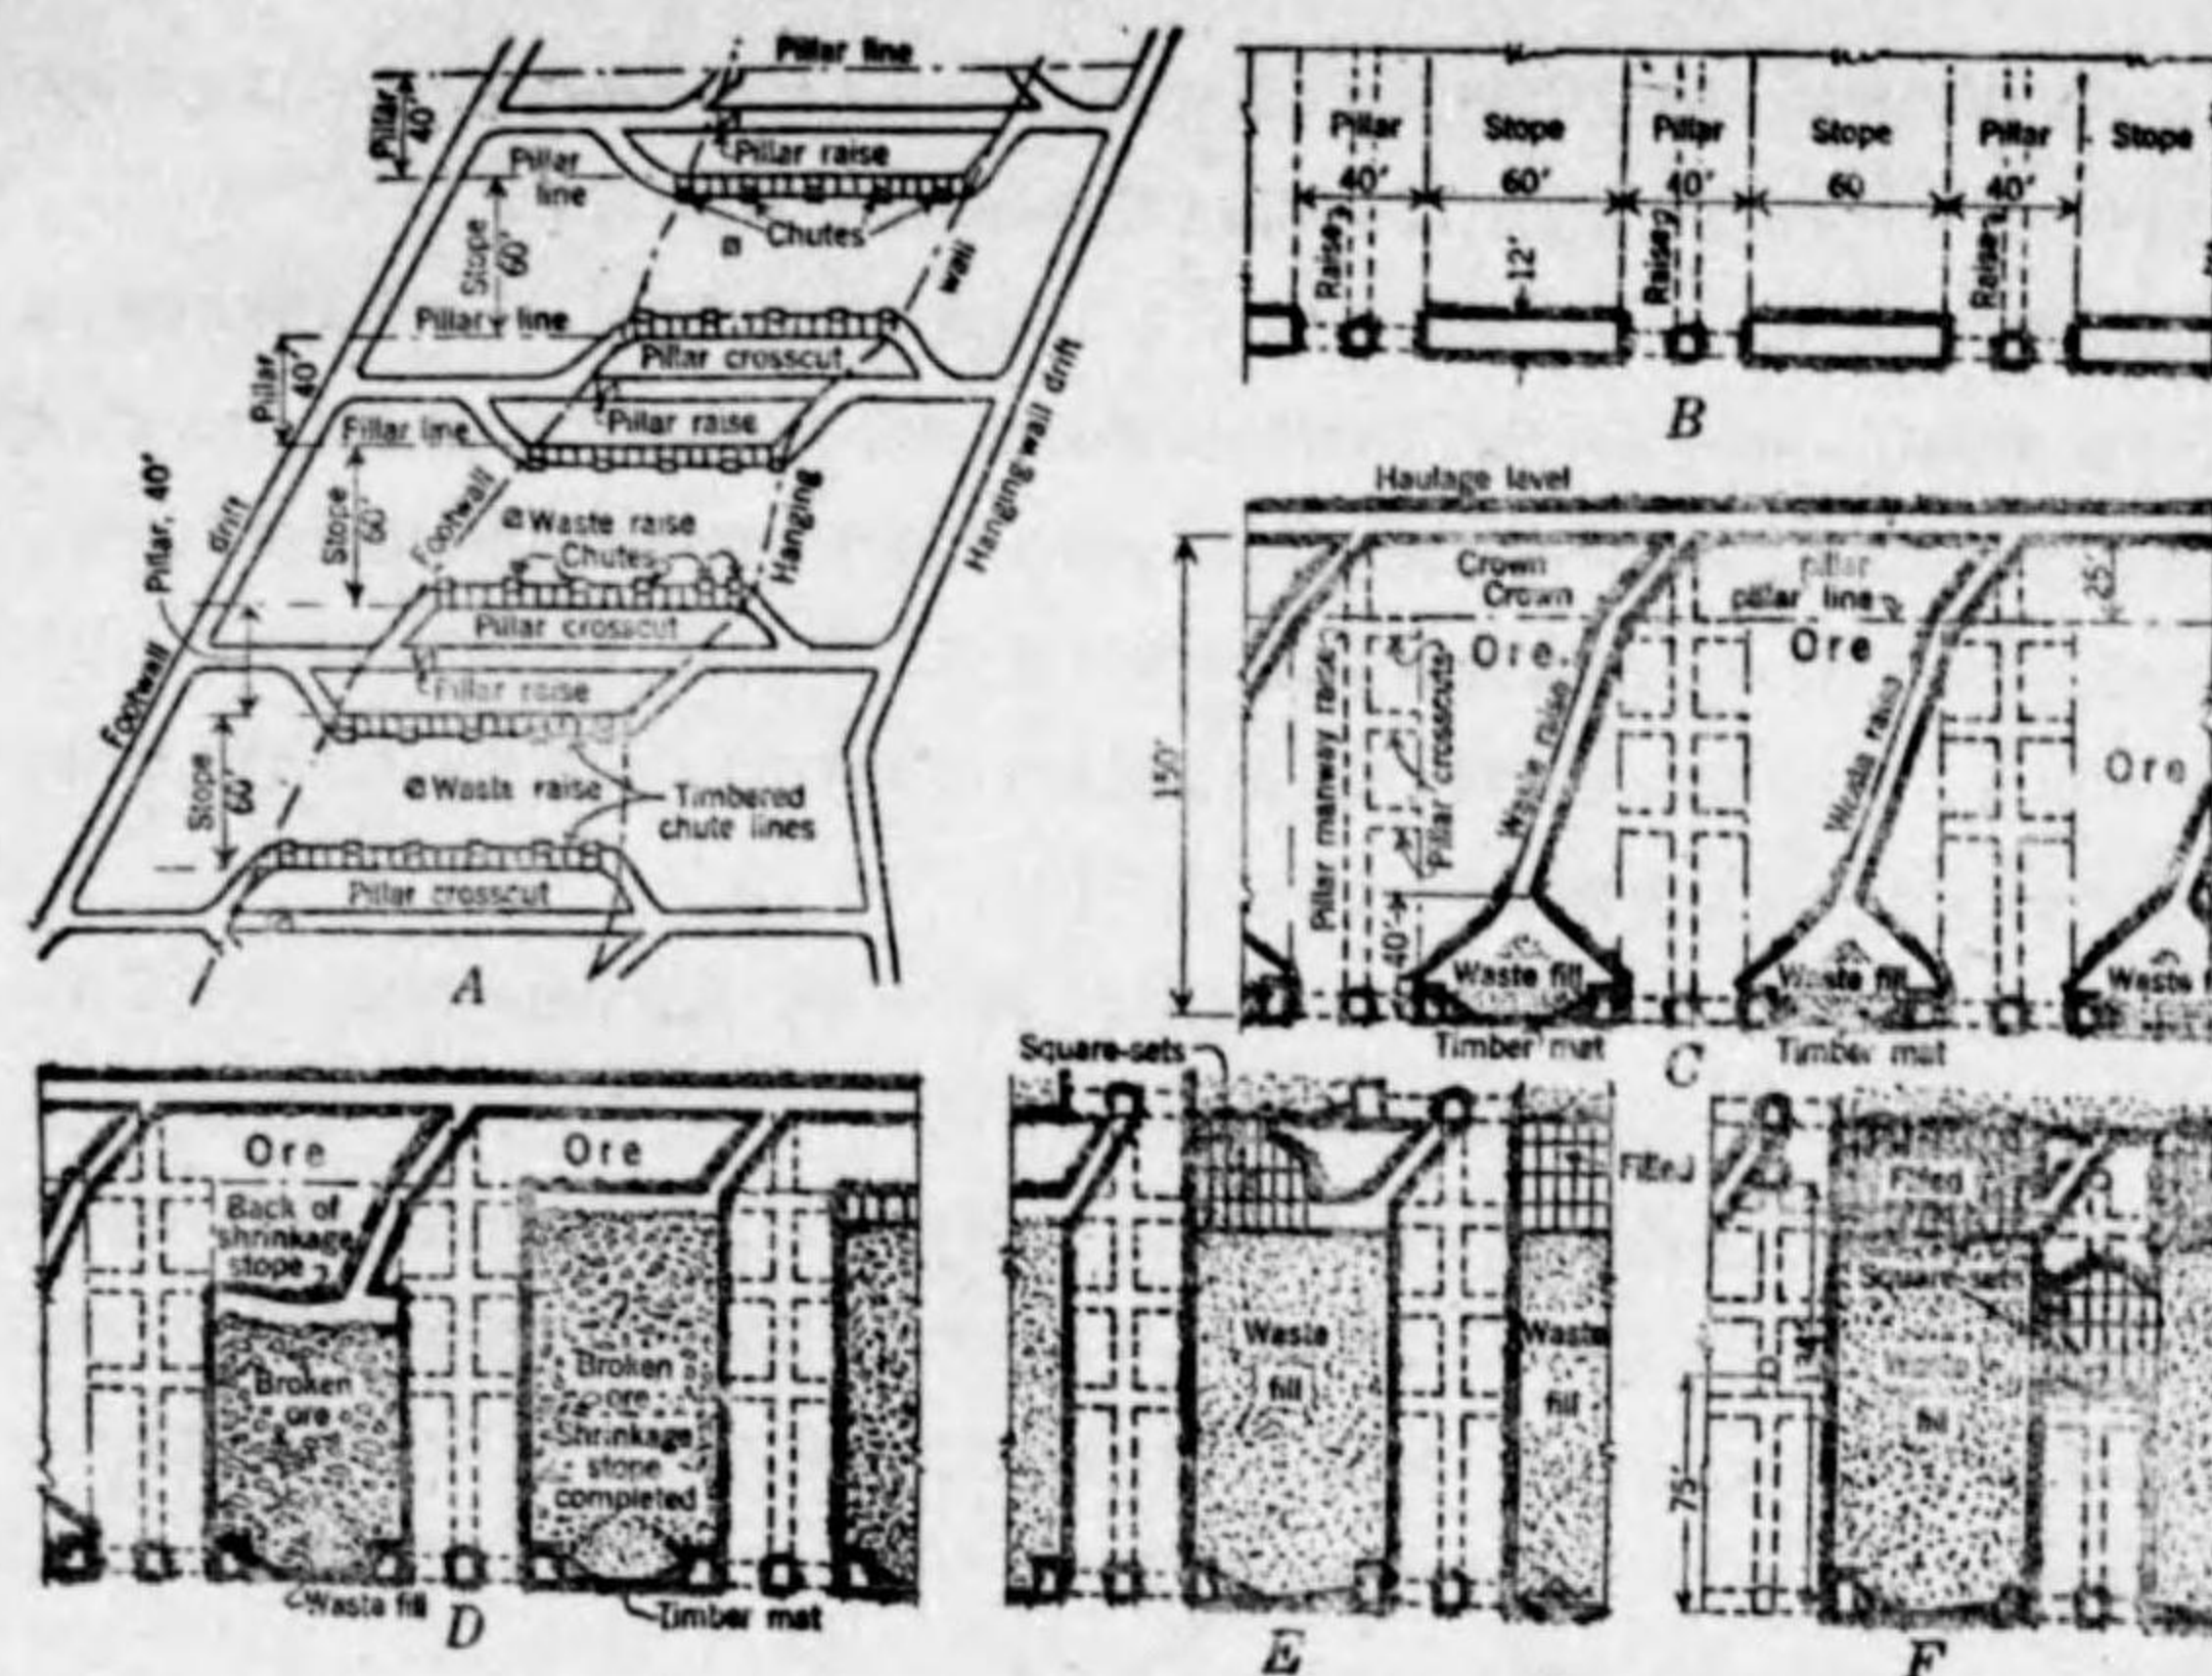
Shrinkage stopping, Homestake mine, South Dakota: A, Sill floor plan showing stope silled out; C, vertical section showing stopes arched and center filled ready to start shrinkage stopping; D, vertical section through shrinkage stopes; E, shrinkage stopes mined and filled, crown pillars being mined by square setting; F, mining stope pillar by square setting.
